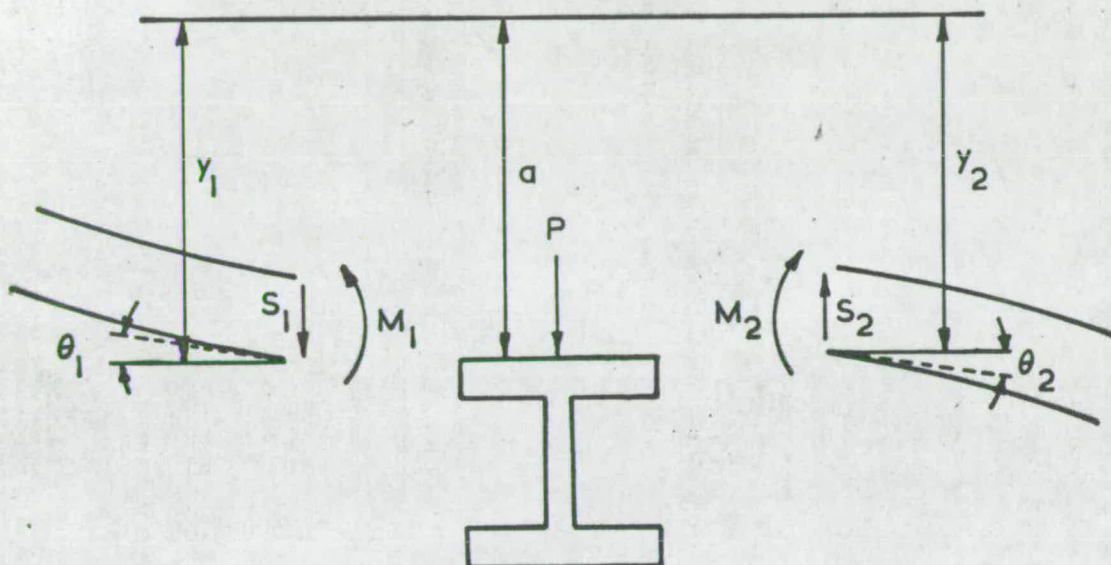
Connection between the transverse medium and a longitudinal beam at mid-span.
